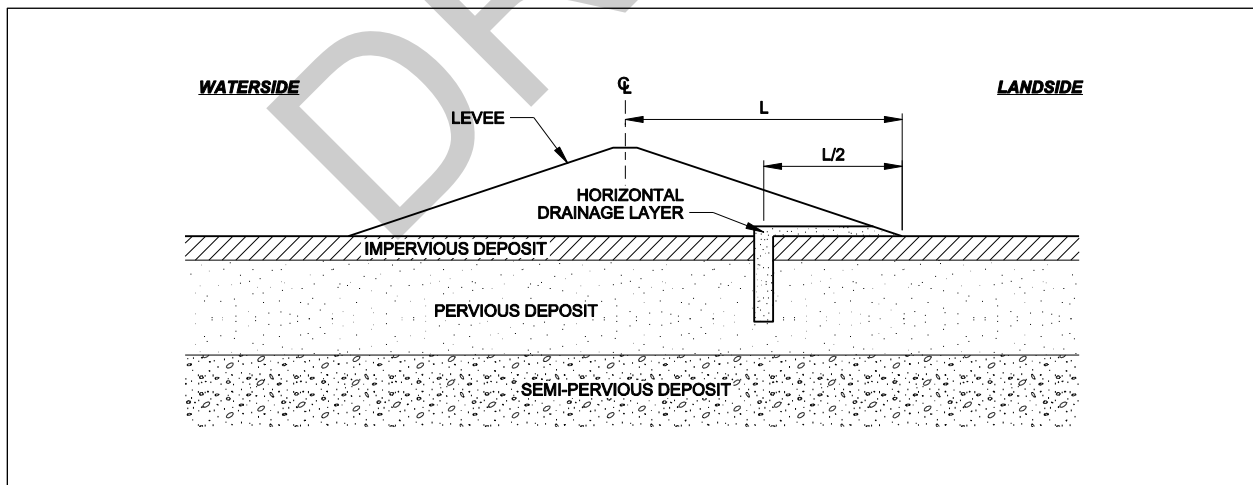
Trench Drain Located Beneath Landward Slope.
